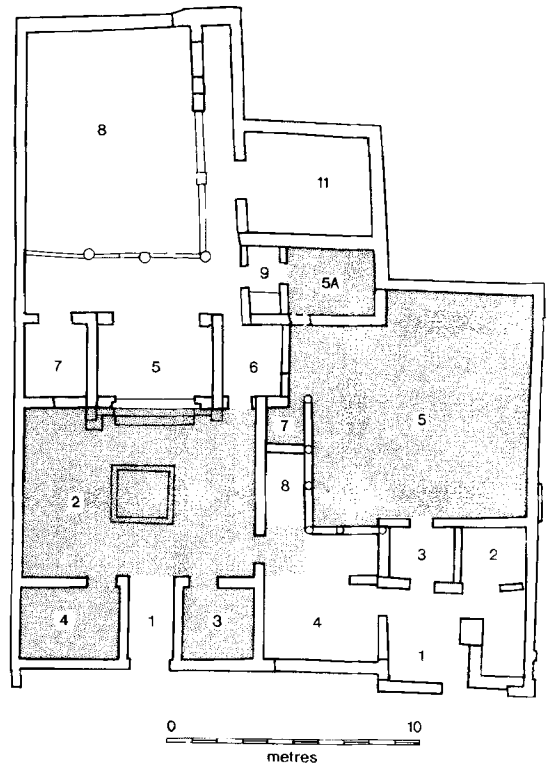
Plan of houses 11–12 showing excavated areas (stippled).
